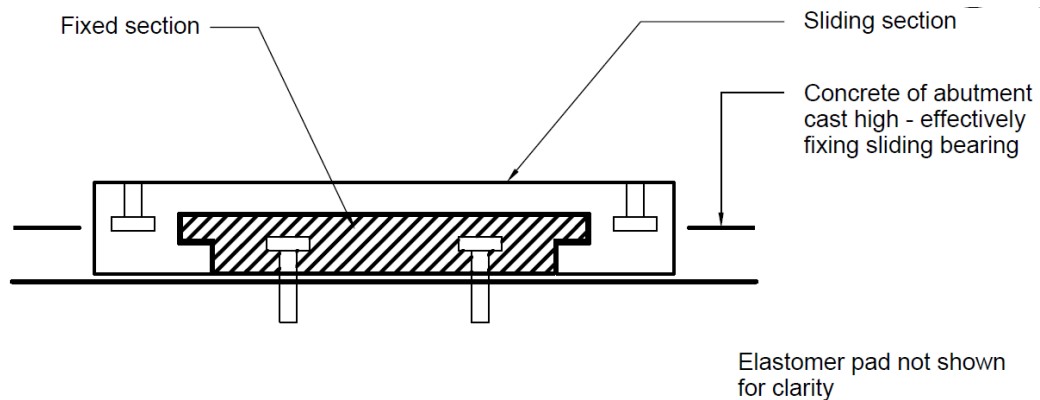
b. Diagrammatic section through guided bearing.
